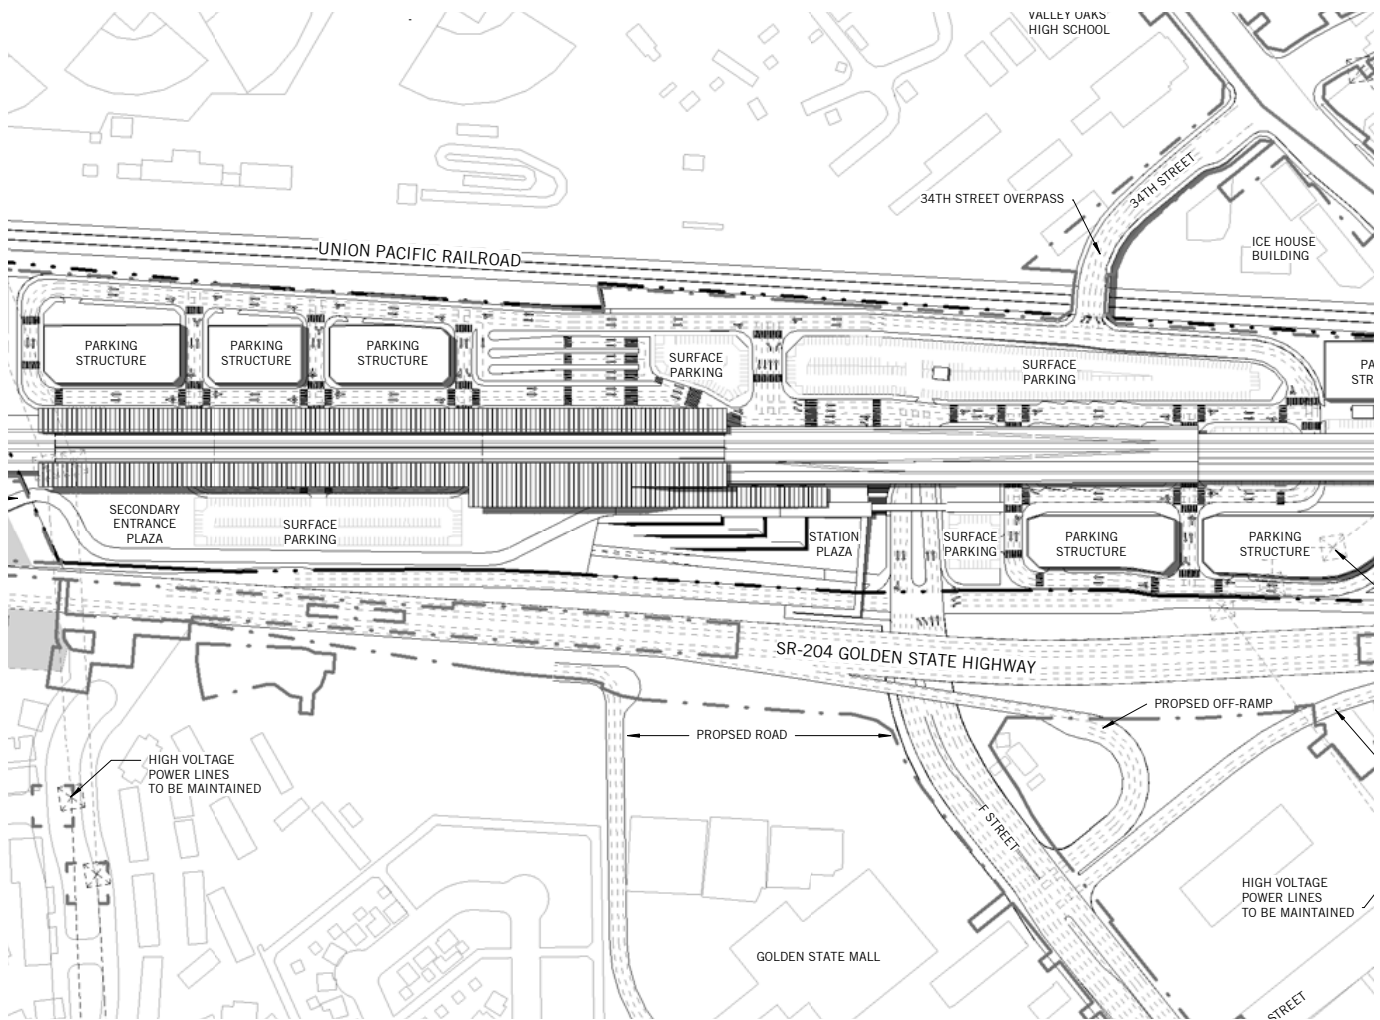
Section of Site Context Roof Plan for HSR Station. Source HSR Environmental Impact Report
